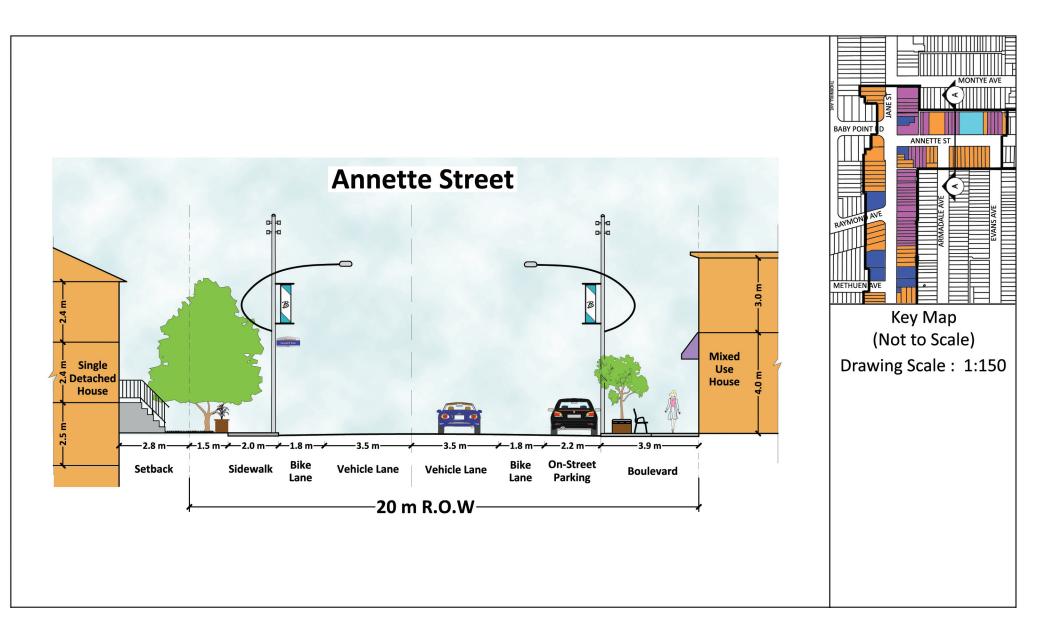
Annette Street Cross-section A (Residential and Mixed Use)
